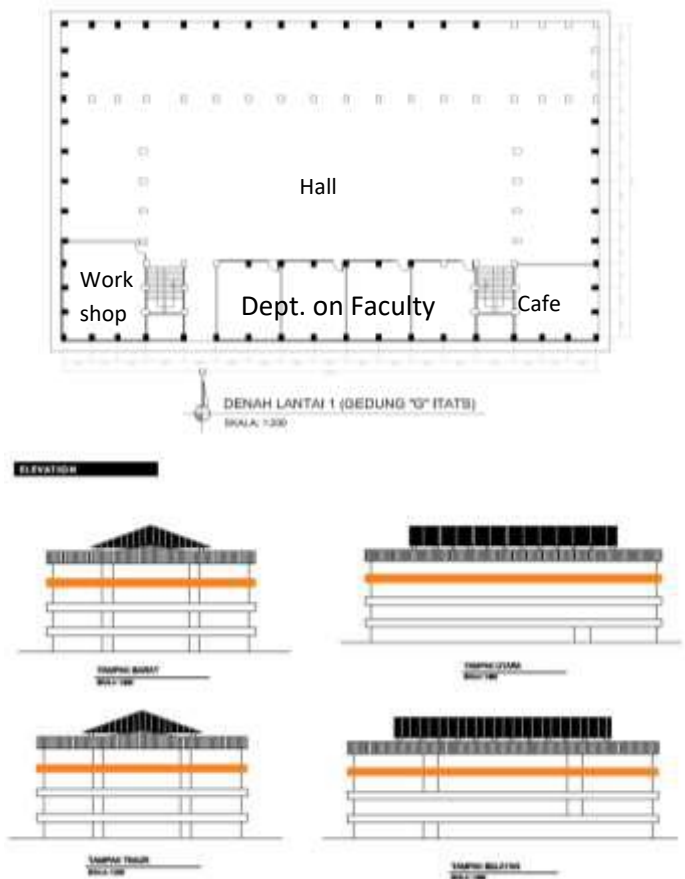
1st floor Plan and Elevation of G-Building ITATS
